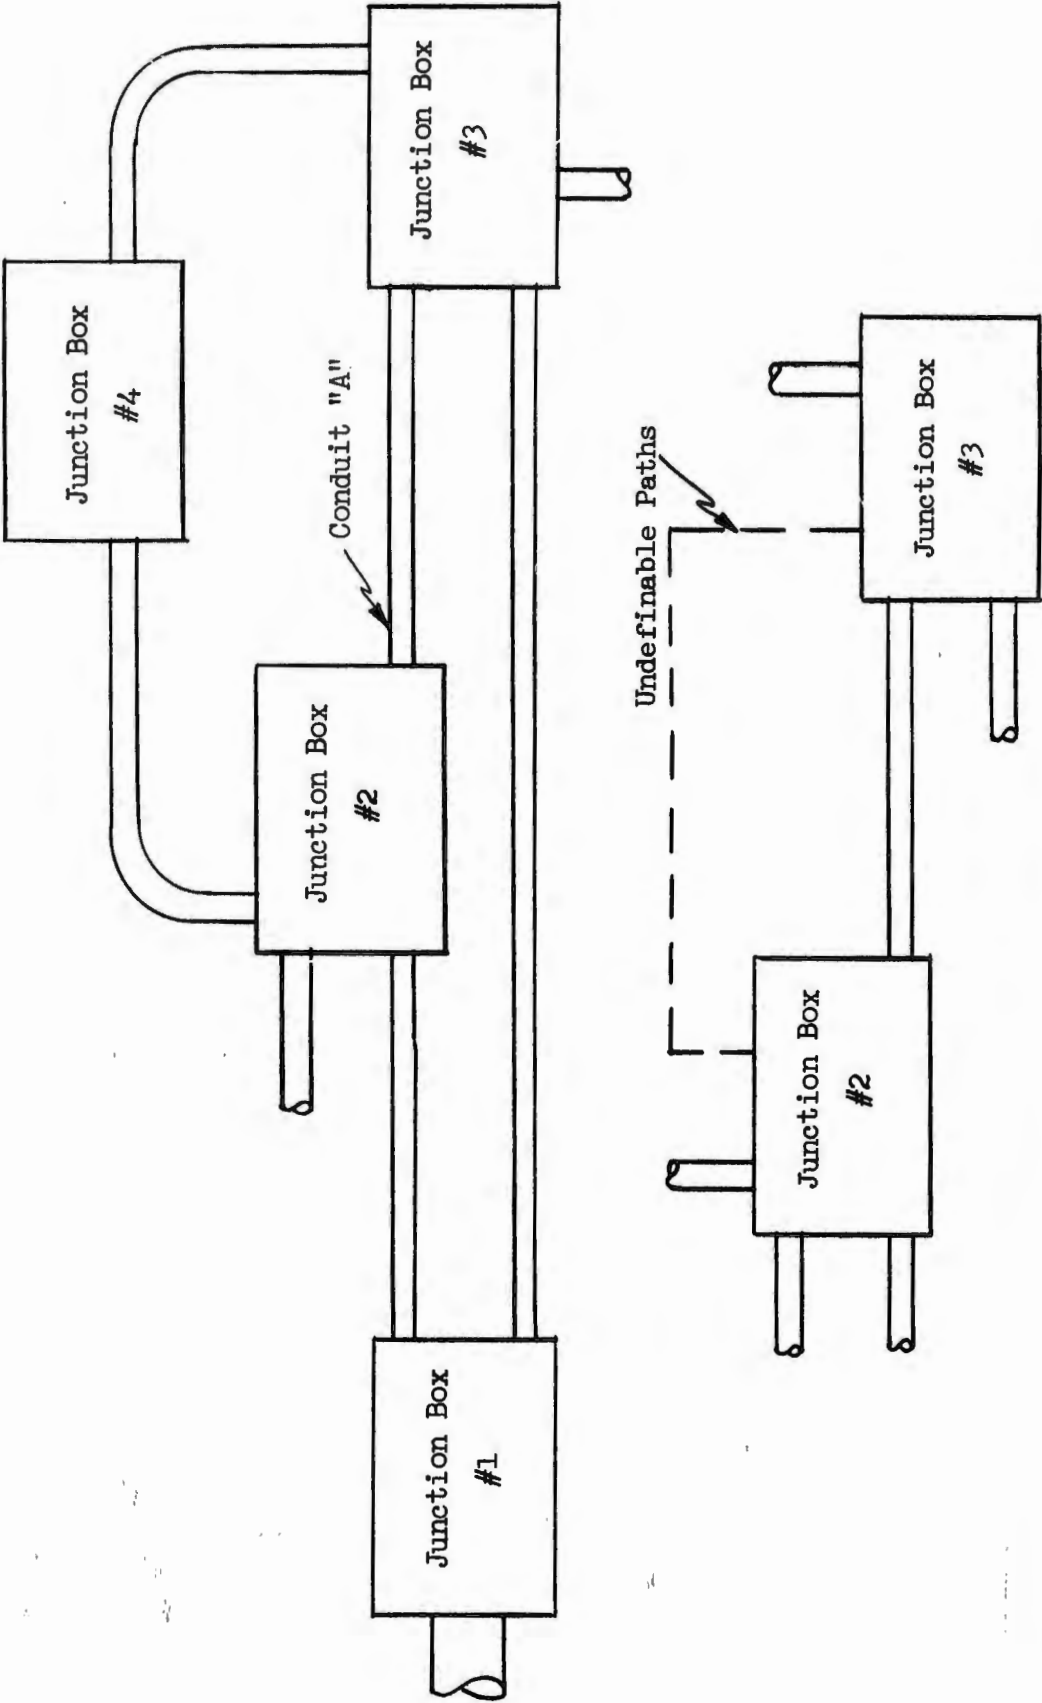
Typical Arrangement of Conduit Runs, Showing Undefinable Current Paths
